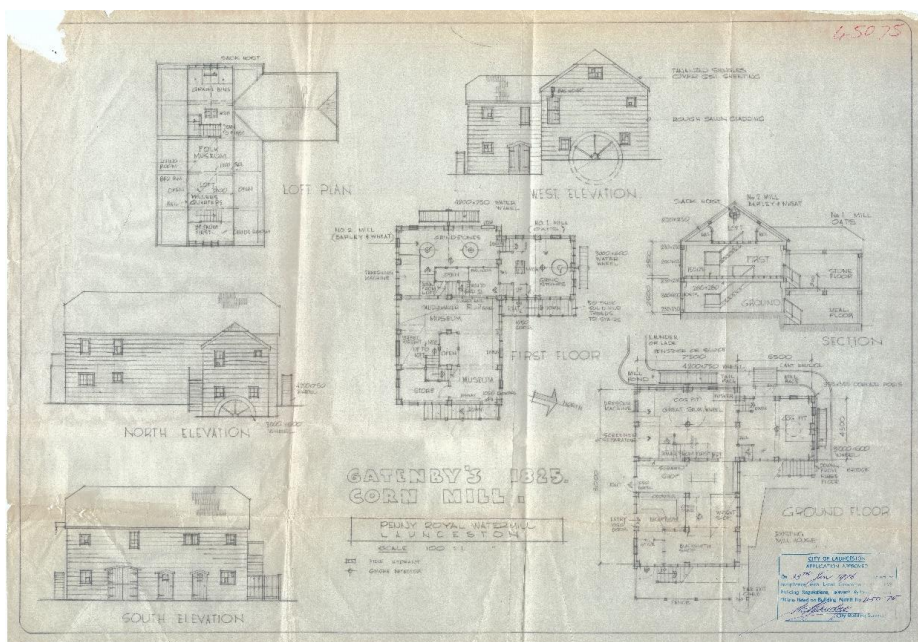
building plans of a replica 'working' corn mill date stamped 1975.
